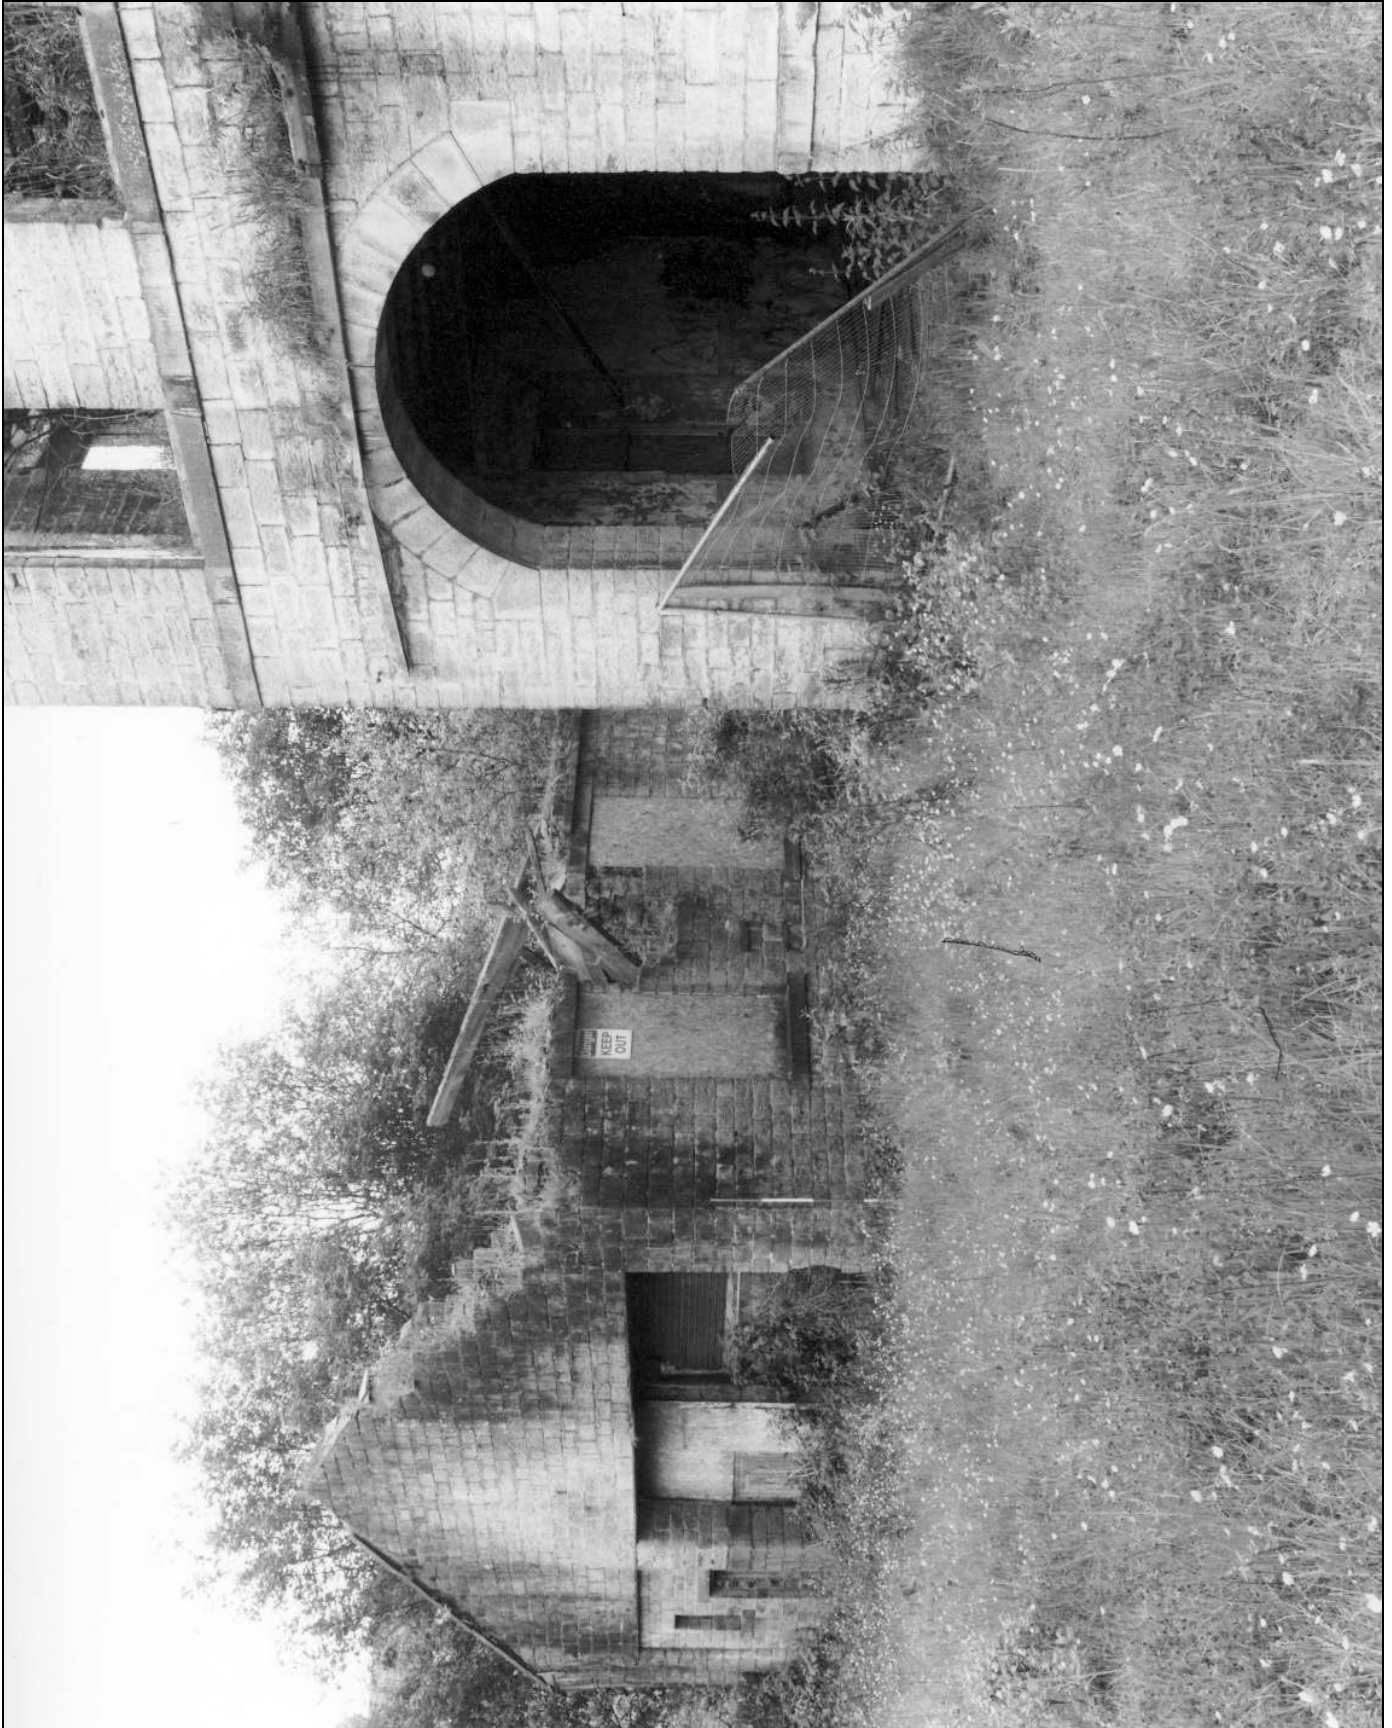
Boiler house (left) and entrance to horizontal engine room, from the north-west (film 3, frame 17)
